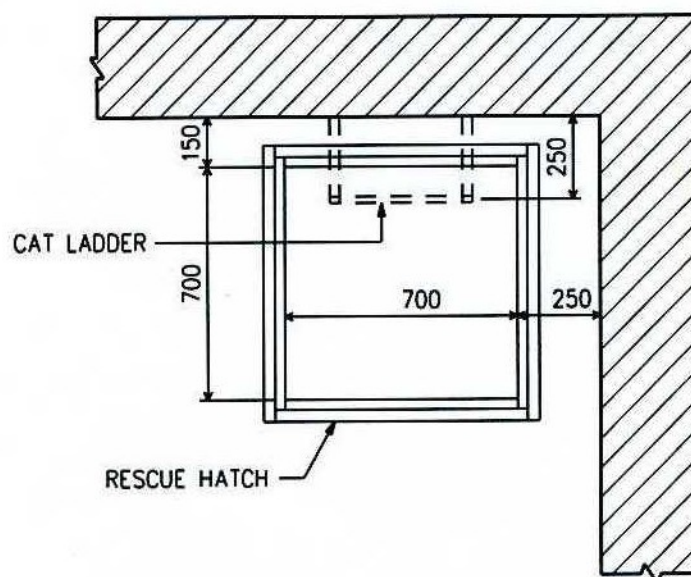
(a) MINIMUM DISTANCE OF RESCUE HATCH FROM SS WALL
